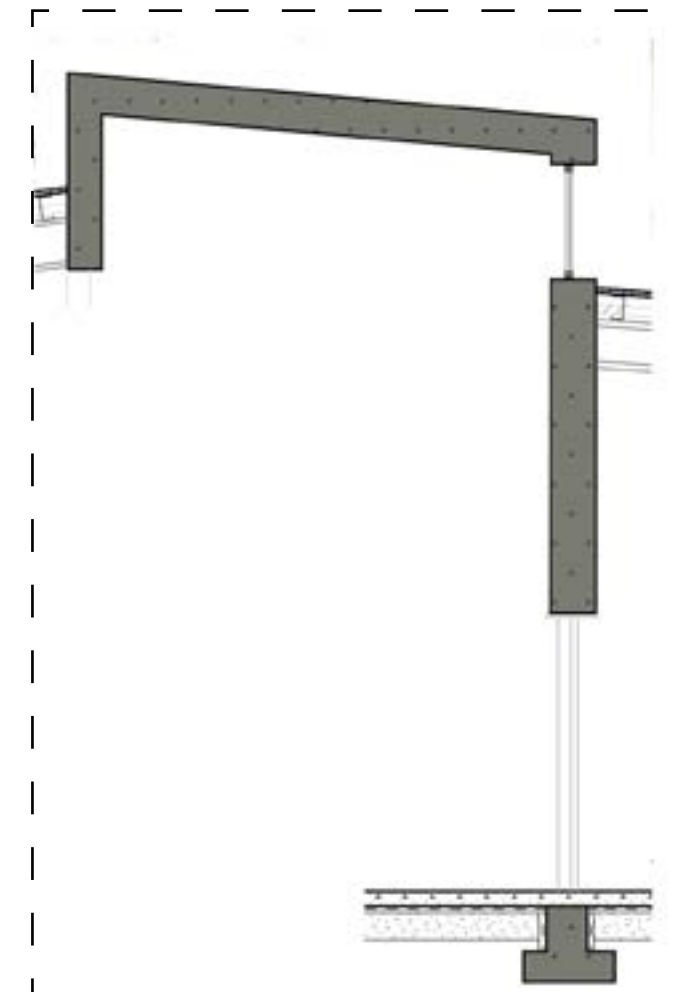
D: Concrete wall and roof structure (Author, 2021)
